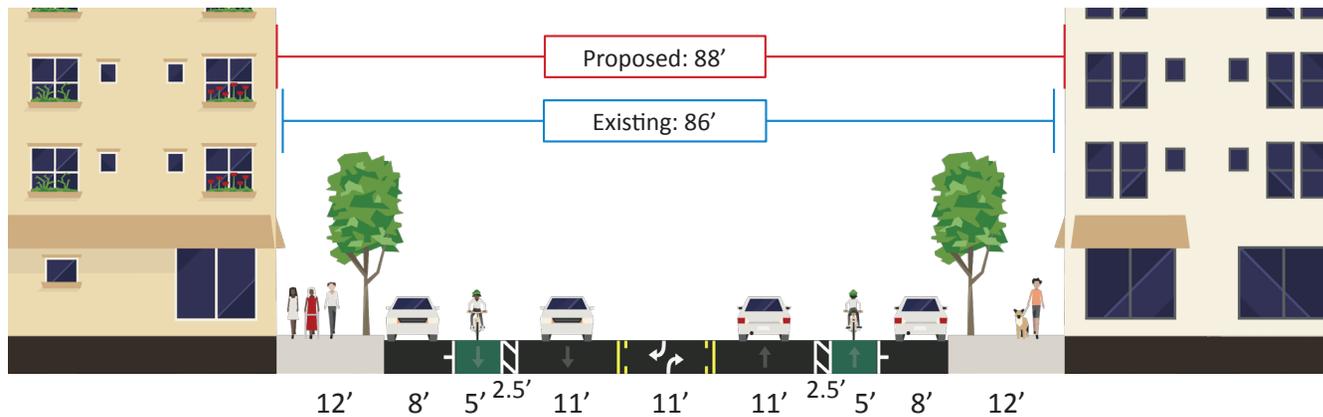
State Street- Proposed Hybrid Alternative Cross Sections
